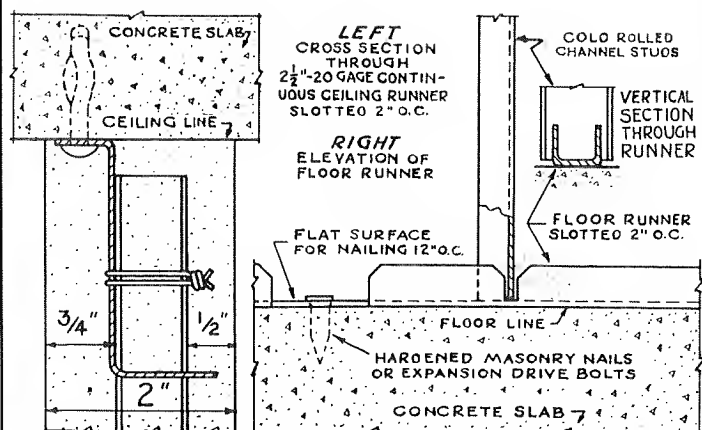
SLOTTED "Z" RUNNER SYSTEM—Z-shaped runners for ceiling have 1/2-inch nailing flange and 1 1/2-inch horizontal flange with openings punched for channel studs. Floor runners are channel-shaped, with upstanding flanges slotted. Studs are first slipped into ceiling runner, and then dropped into floor runner.
